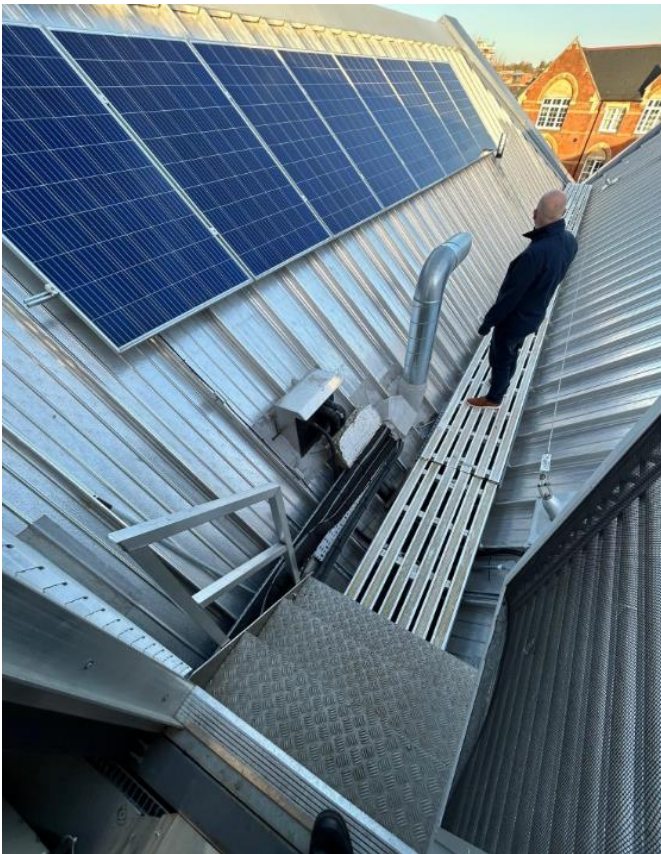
view of proposed new plant enclosure location, from existing enclosure
